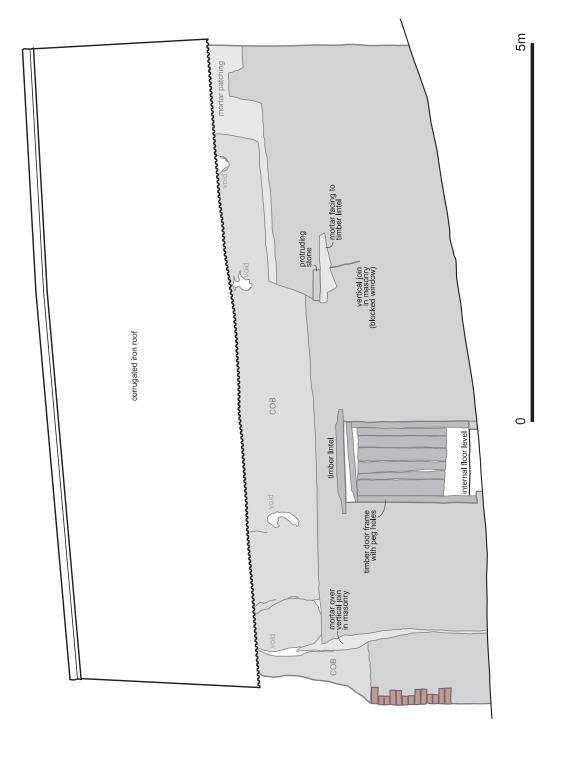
The Chapel at Lower Alsworthy, exterior elevation of south wall (scale 1:50 @A4).
